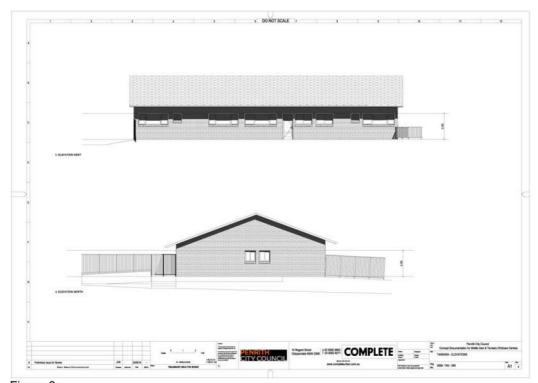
Existing Elevations 02– Subject site Source: Complete Urban Pty Ltd
